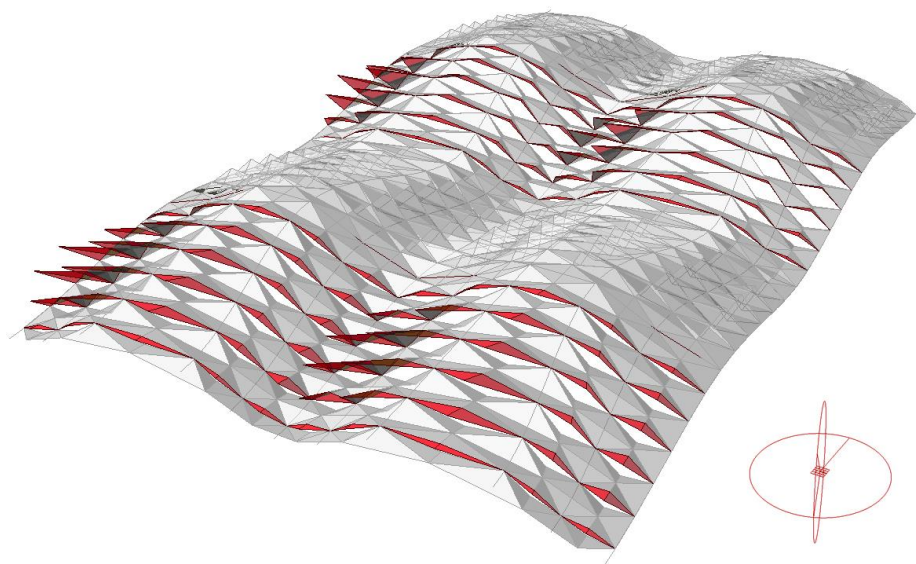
Origami Roof, shading extension formulation according to roof geometry and sun vector
